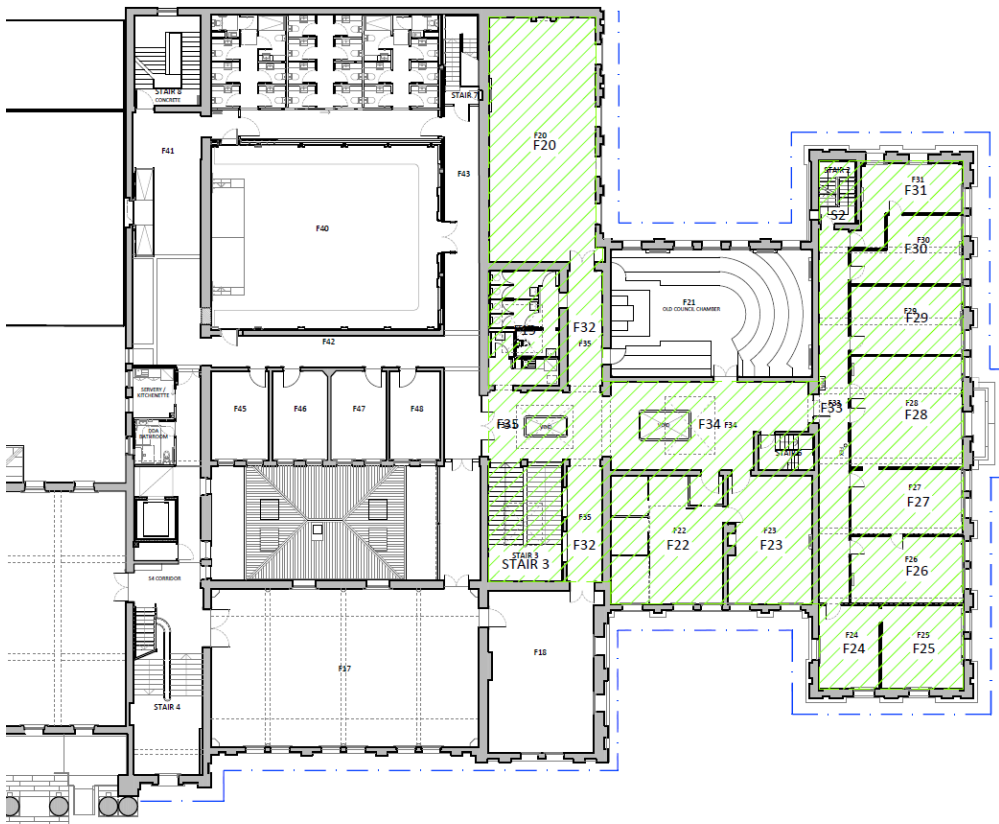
First floor plan of Trades Hall indicating works areas (green shading) included in the project
